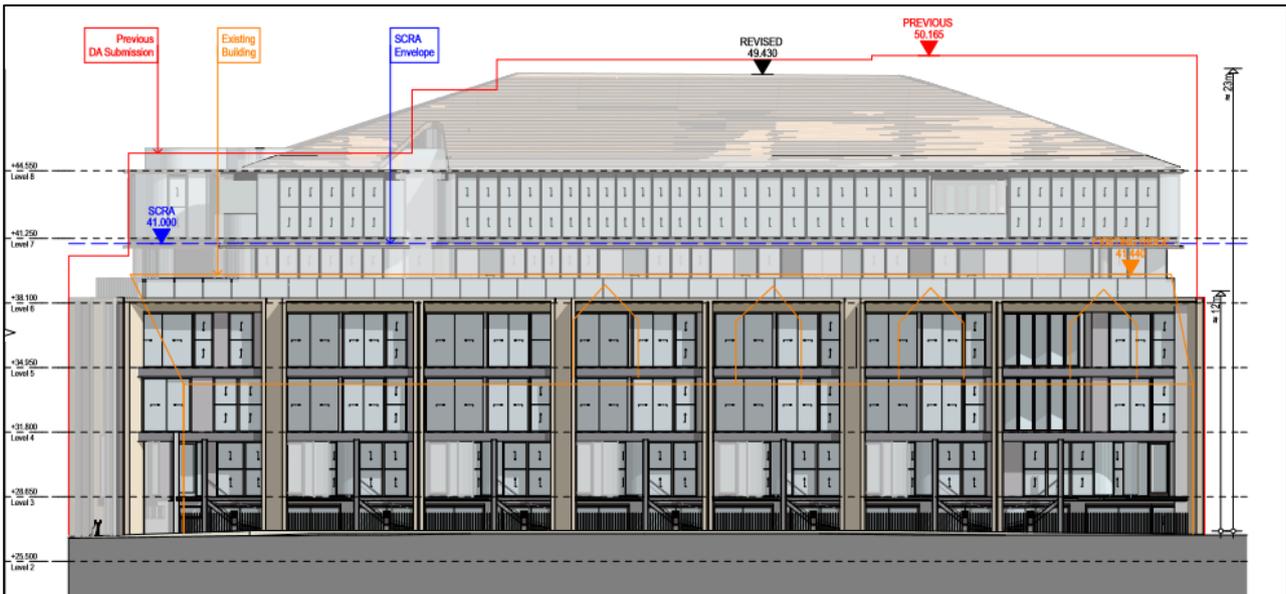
Western (Gloucester Street) elevation of Building 1 (Source: Architectural Plans)
